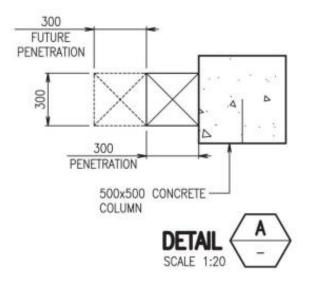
Typical penetration arrangement adjacent to columns and zone for future penetrations (DGN 01)
